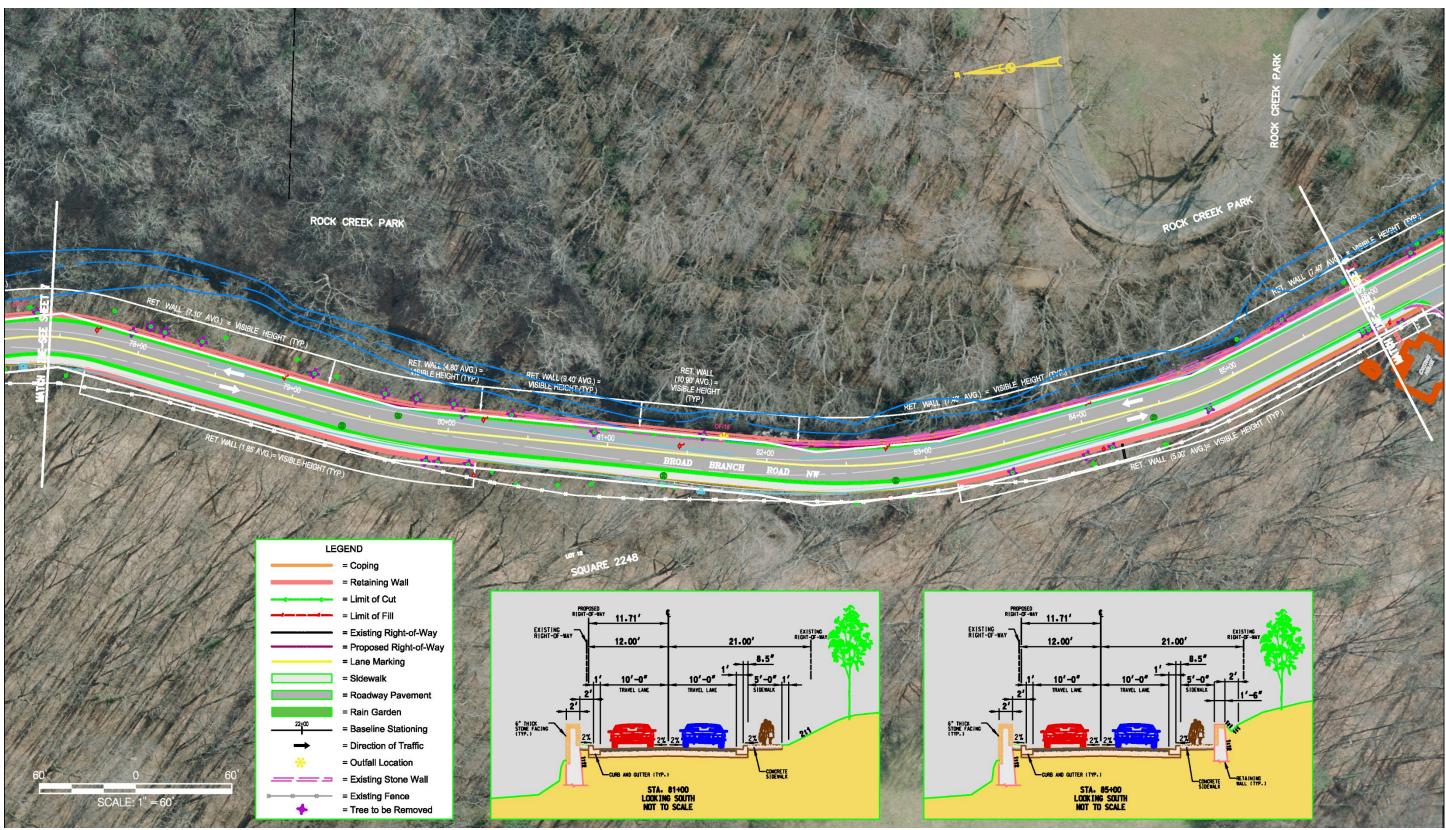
Alternative 3 Modified (Sheet 8 of 9)
